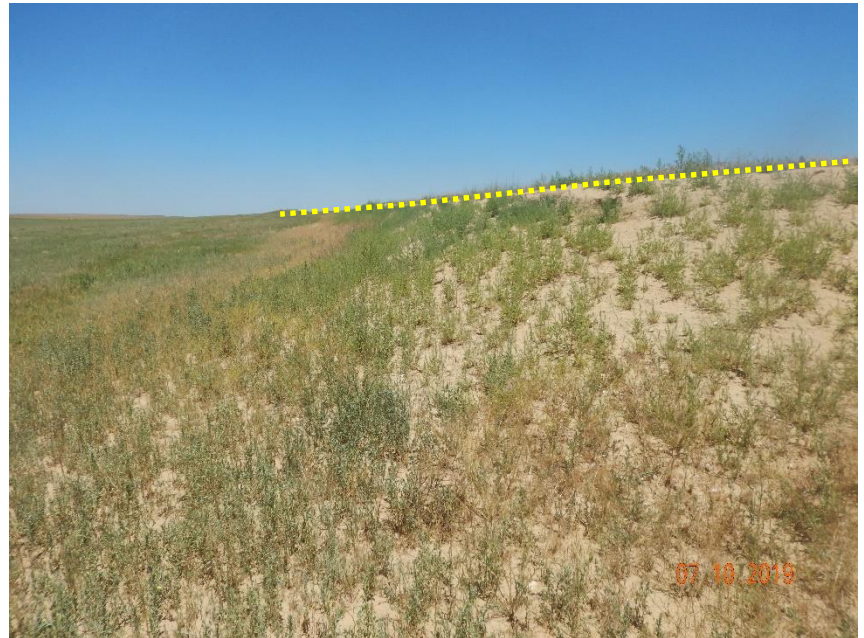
Photo taken from the southwest corner of the location, facing northeast. Previous inspections documented slopes on location remain predominantly bare and exposed soil, or vegetated by undesirable weedy plant species, stormwater and erosion degradation evident. Slopes remains bare and erosion degradation remains evident.
